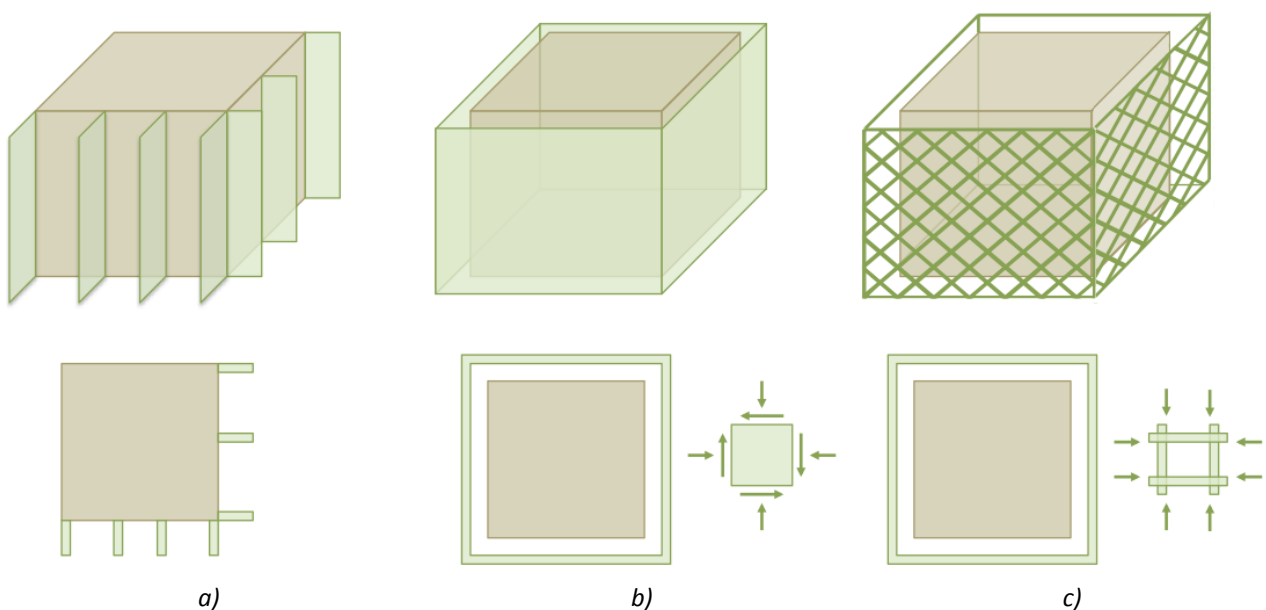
Possible structural layouts of the additional exoskeleton for the holistic renovation of the building stock: a) 'wall' system; b) 'shell' system; and c) 'gridshell' system. Diagrids are a particular case of gridshell structures
